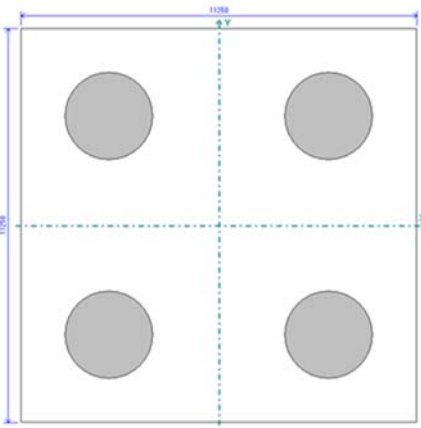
Substructure Form of Marine Bridge Sections
